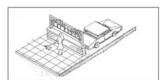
Surface parking screened by an architectural wall and trellis.
